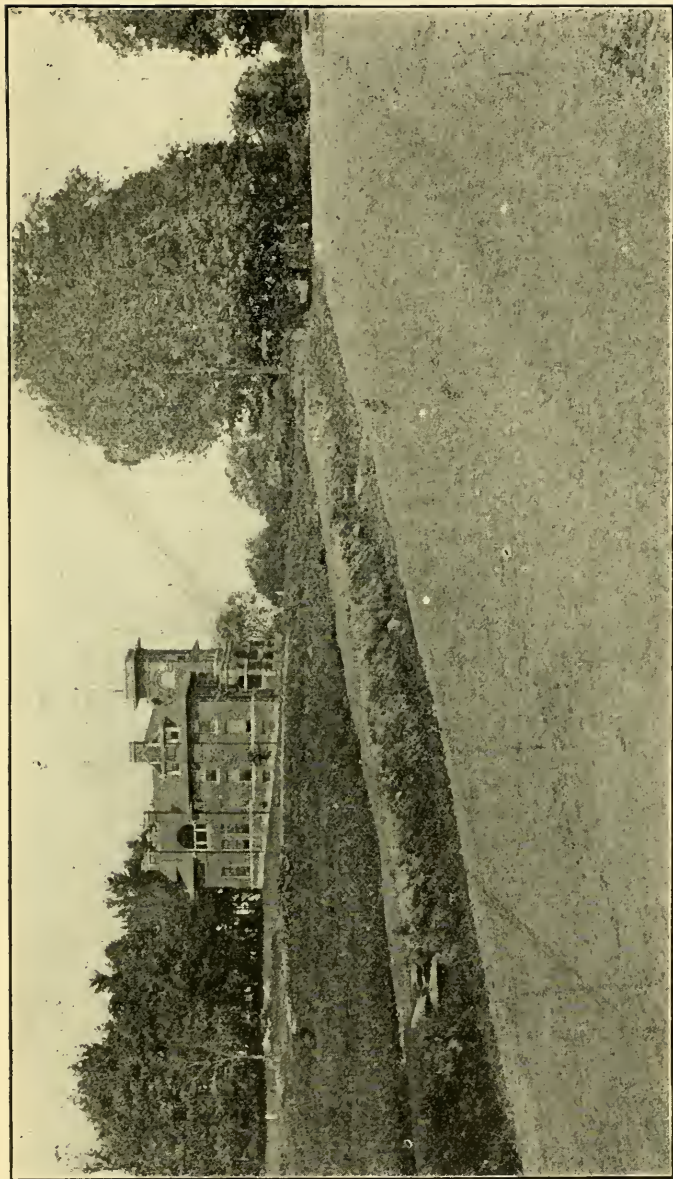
Completed Macaulamized Road, with Experiment Station building in the background. (From photograph.)
